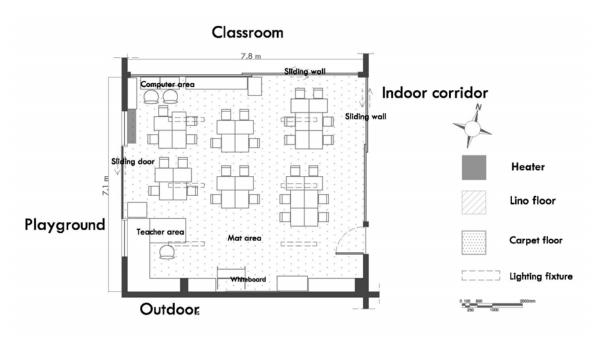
NORTHLAND CLASSROOM'S FLOOR PLAN.
